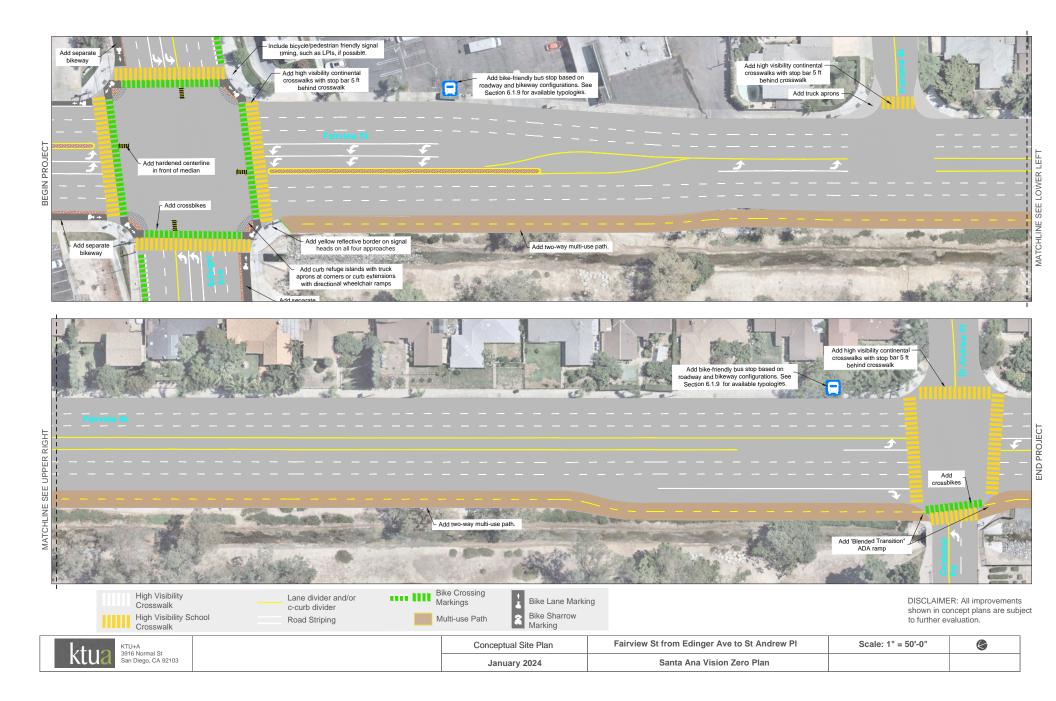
Fairview Street from Edinger Avenue to Centennial Road Recommendations
